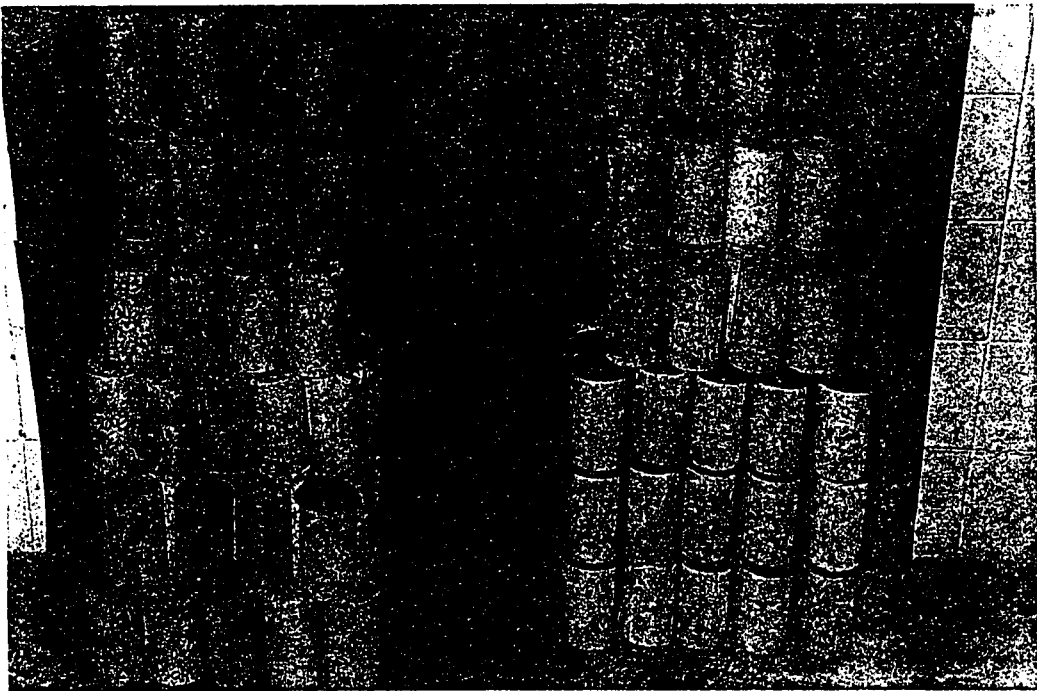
Some of the Concrete Specimens used for Compressive Strength
